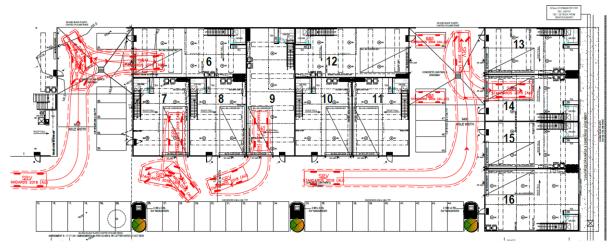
FLOOR PLANS (WAREHOUSES 6 TO 15)
